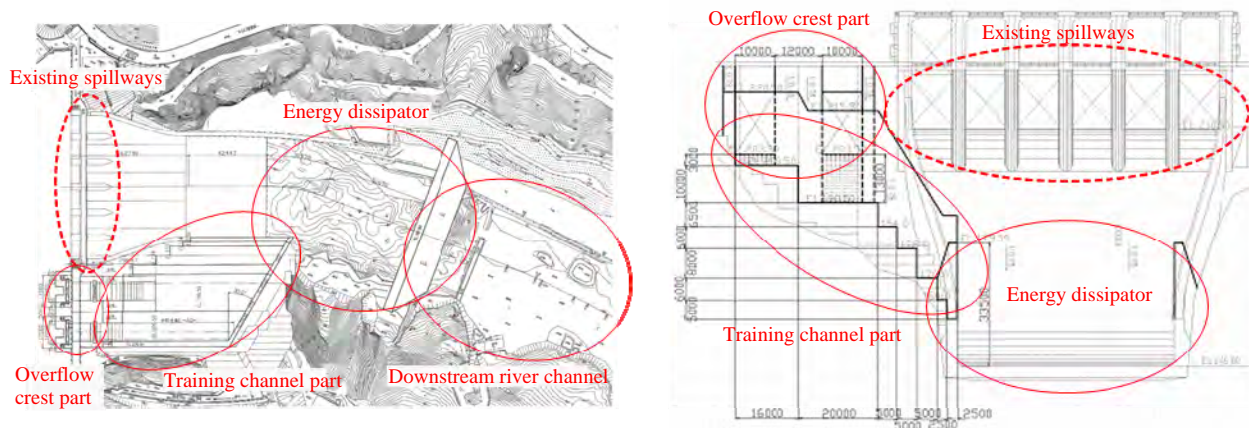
Plan view (left) and downstream view (right) of the original design shape
